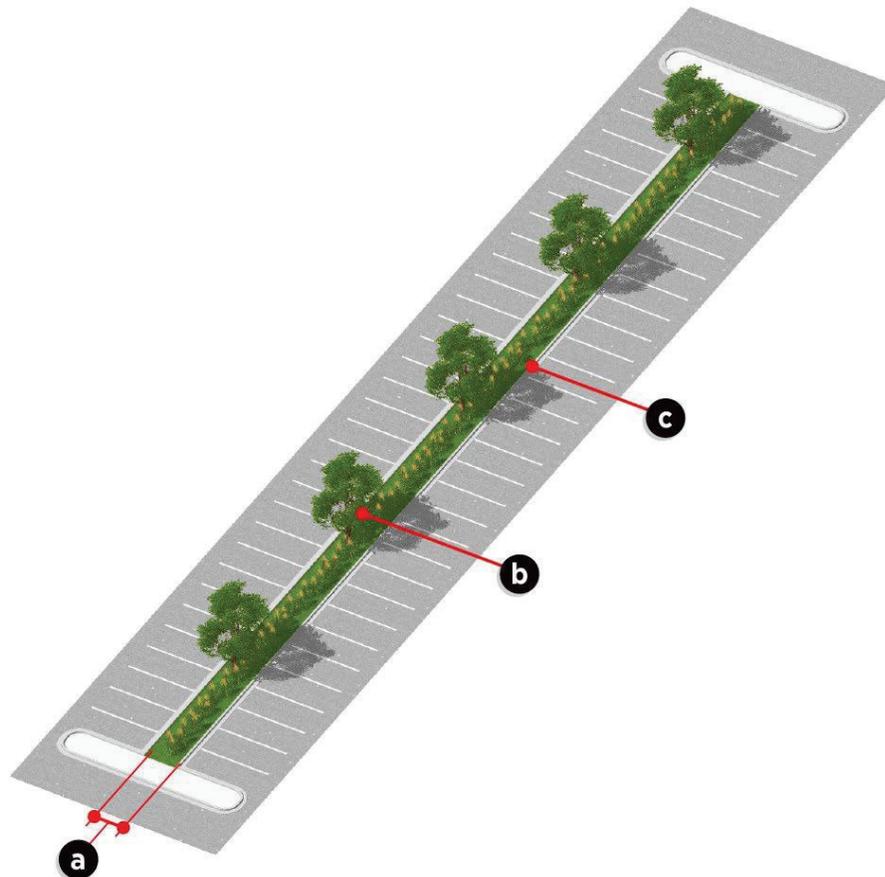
Parking Area End Cap Standards - Double Bay Parking
